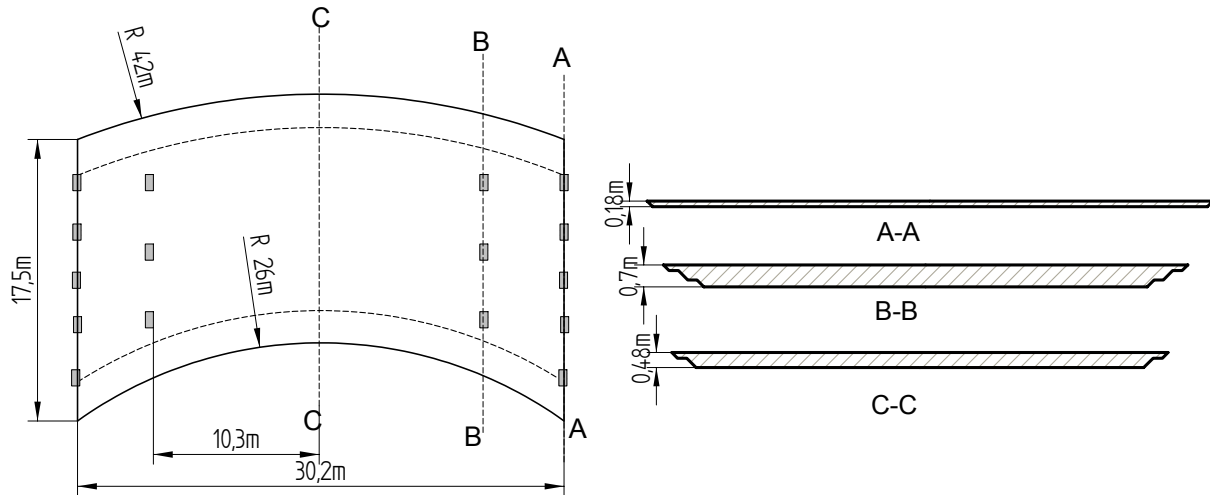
Plan and deck cross-section of the structure (dimensions in metres).
